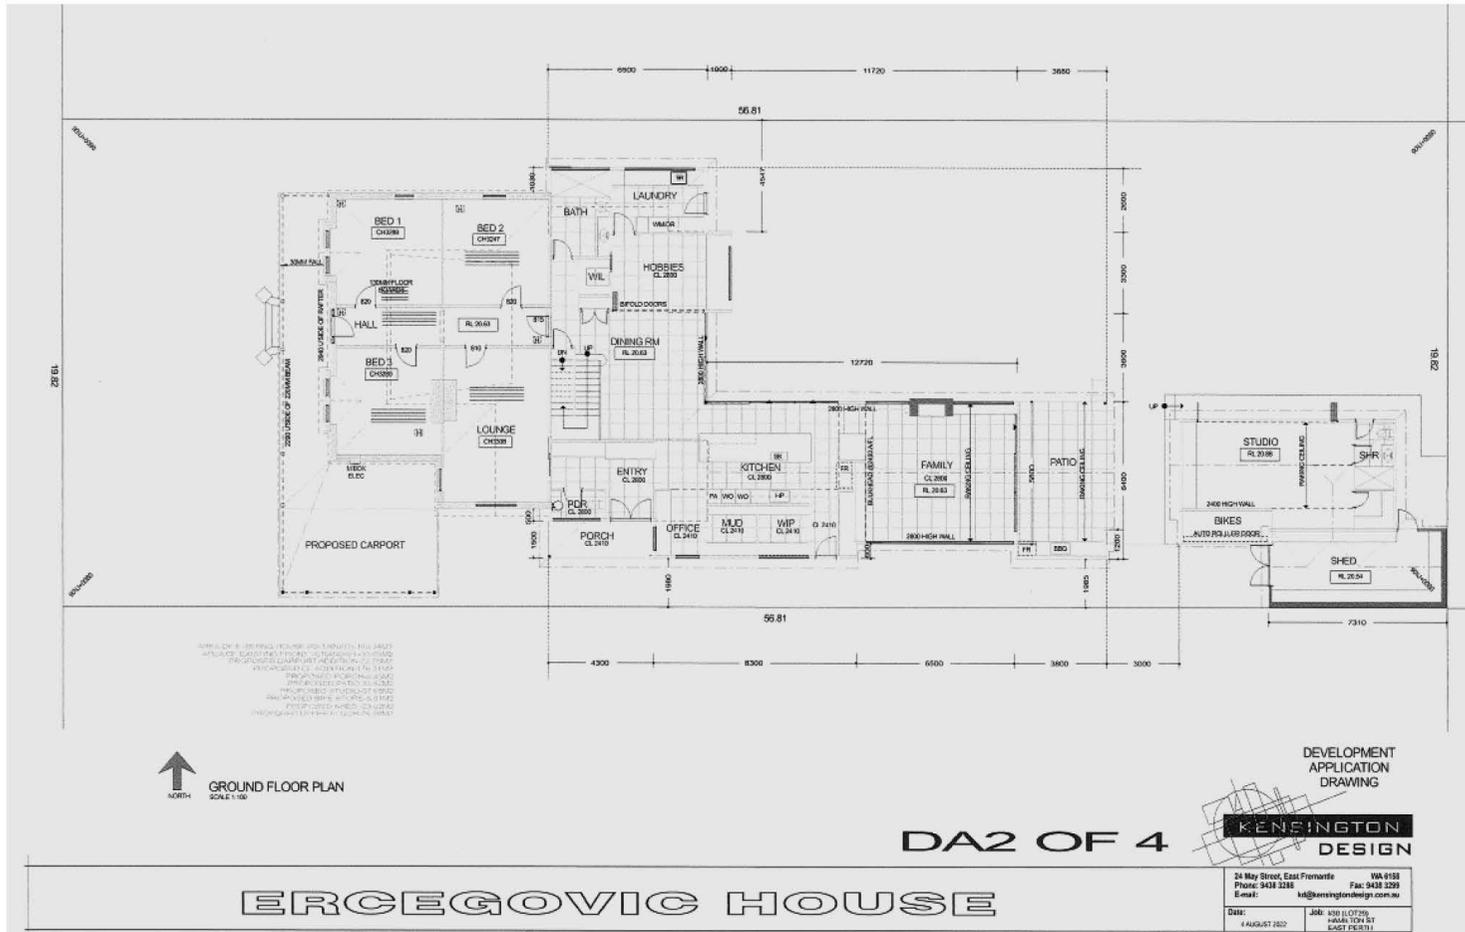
Site plan showing location of new additions. Courtesy Kensington Design
